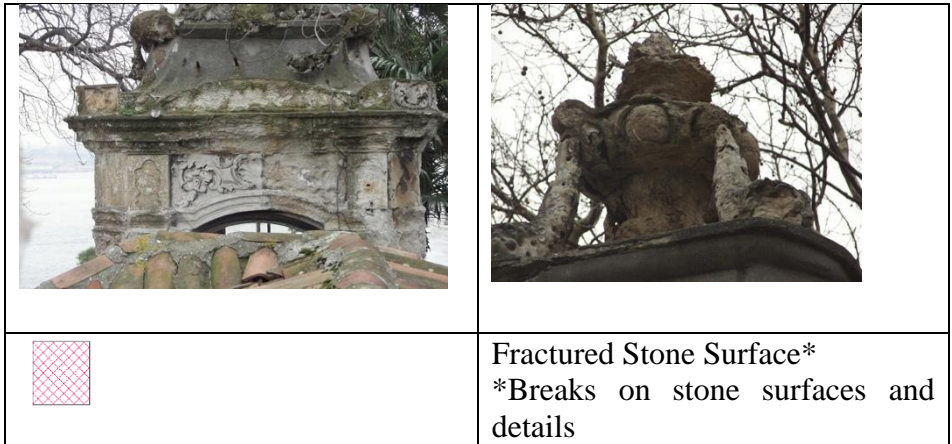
Mecidiye Gate Northeast Entrance Facade (Author Archive, Bimtaş, 2009)
